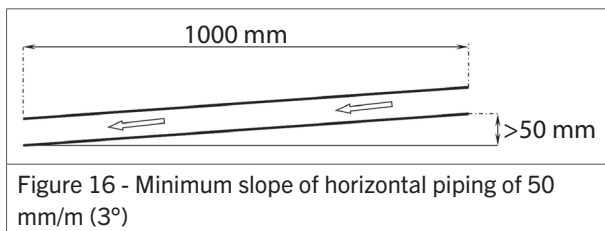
Minimum slope of horizontal piping of 50 mm/m (3°)
